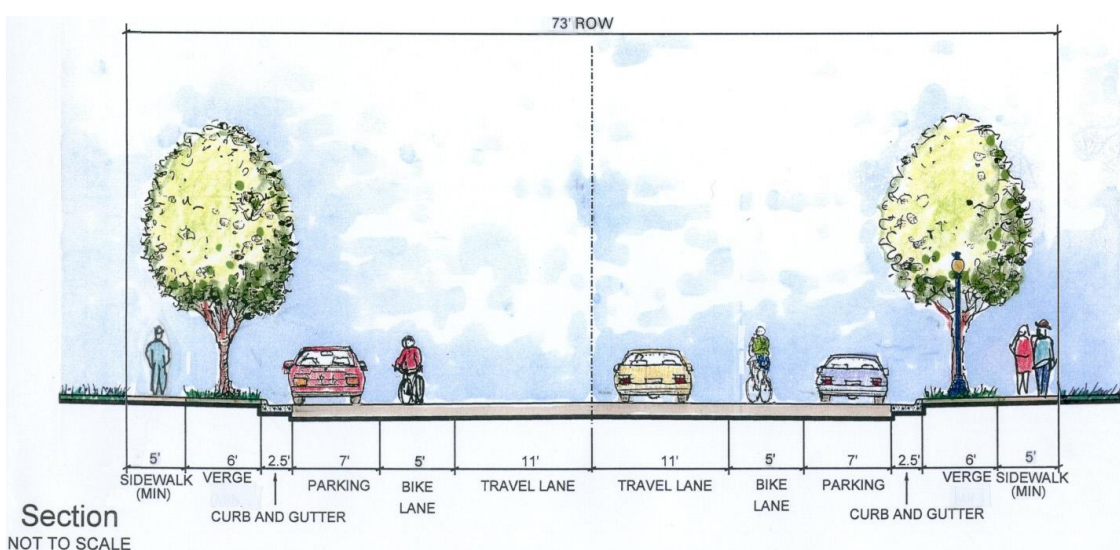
Striped Bike Lanes and Parking Cross-Section
